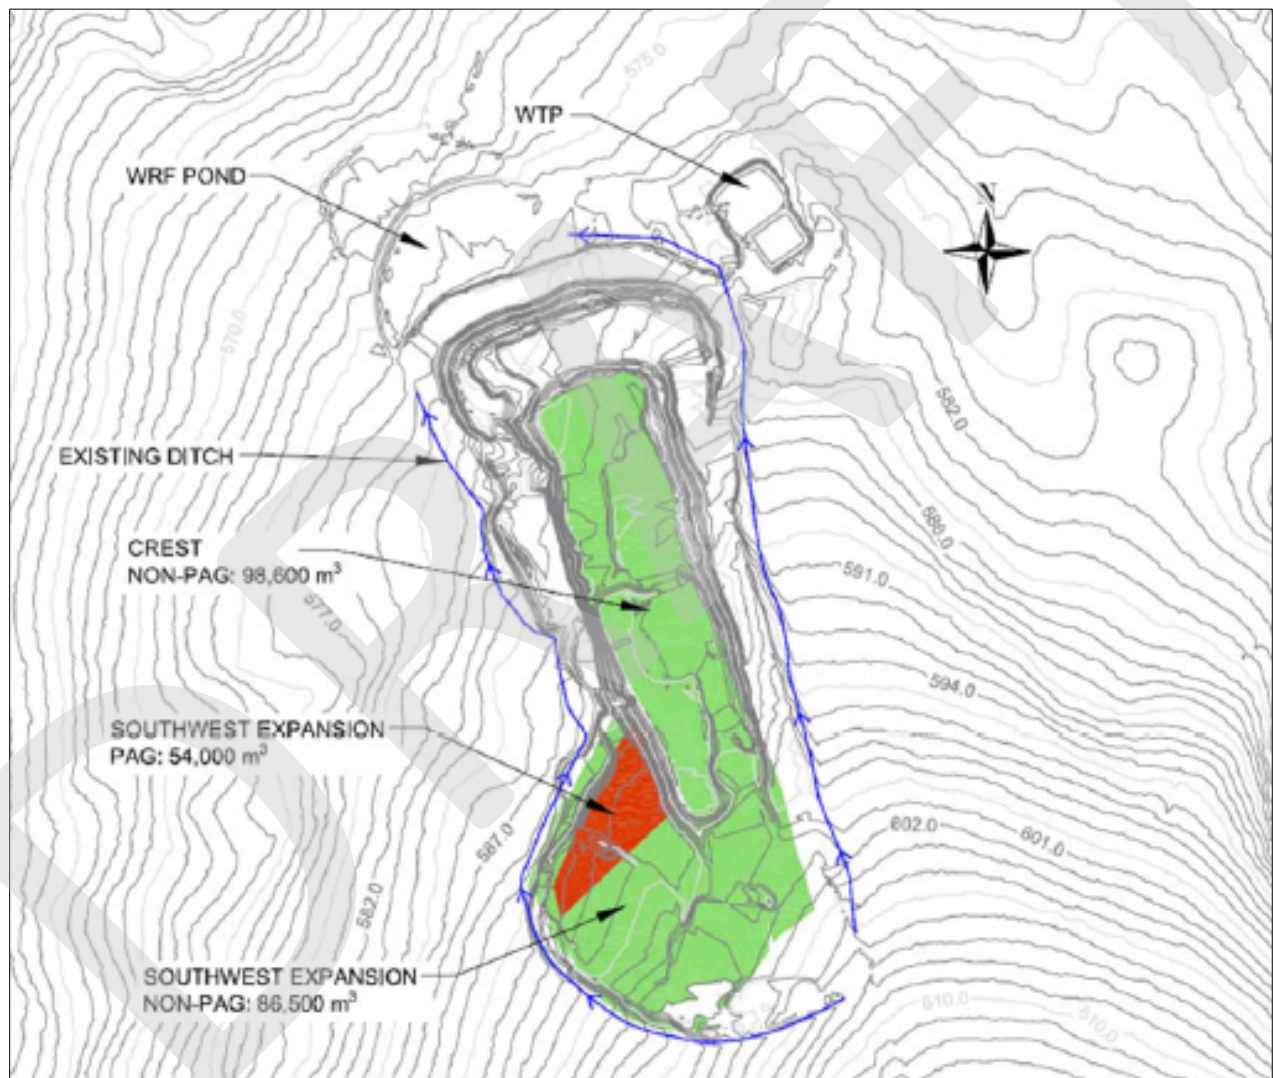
~~Waste Rock Deposition Plan – Summer 2018 – Plan View~~ Placement – February 2019 through May 2019
